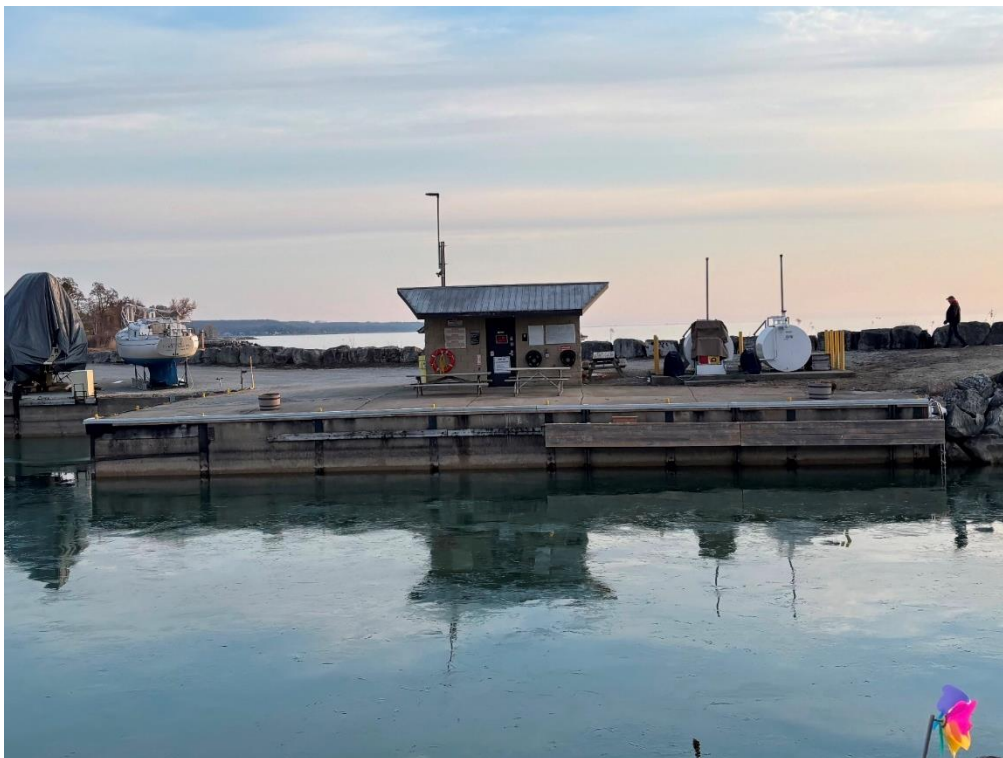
Fuel Tanks and Pump House (10/04/2025)
